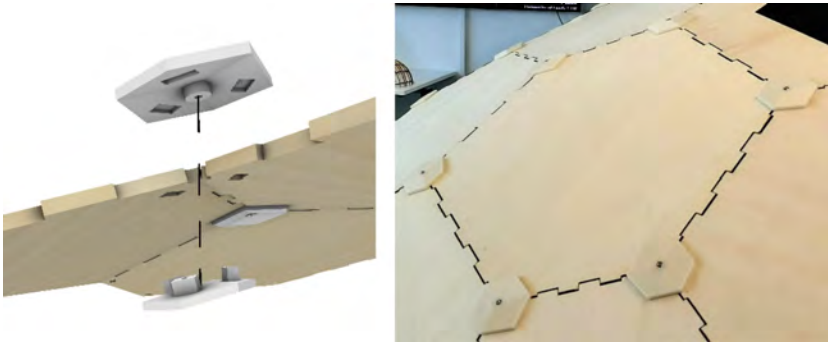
Parametrically designed, 3D printed connections for the ECHO shell and arch. Printed from PLA plastic, the top and bottom parts are fastened together to constrain the 6 mm thick plywood panels.
